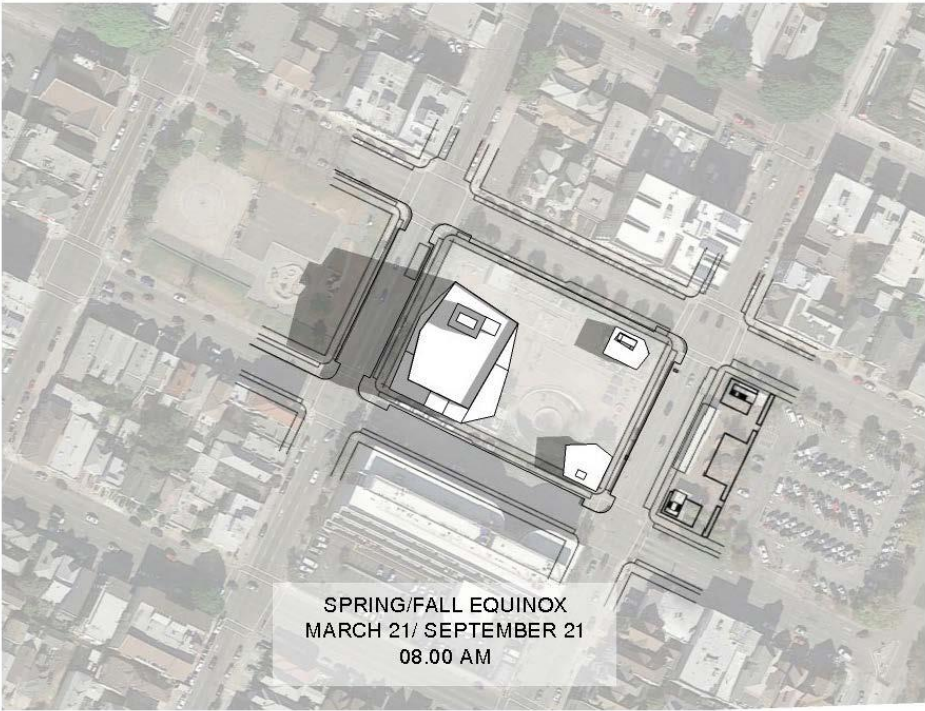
Shadows cast by the proposed TOF building on spring/fall equinox at 8 a.m.
